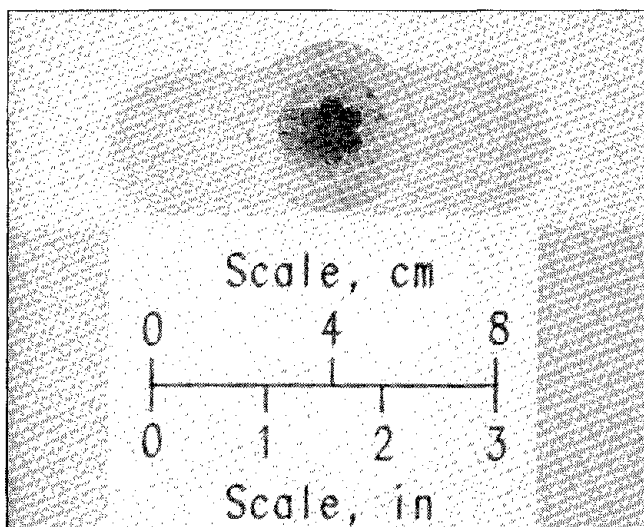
Cross section of a 1.52-cm- (0.60-in-) diameter cable installed in a 2.5-cm- (1-in-) diameter hole.
